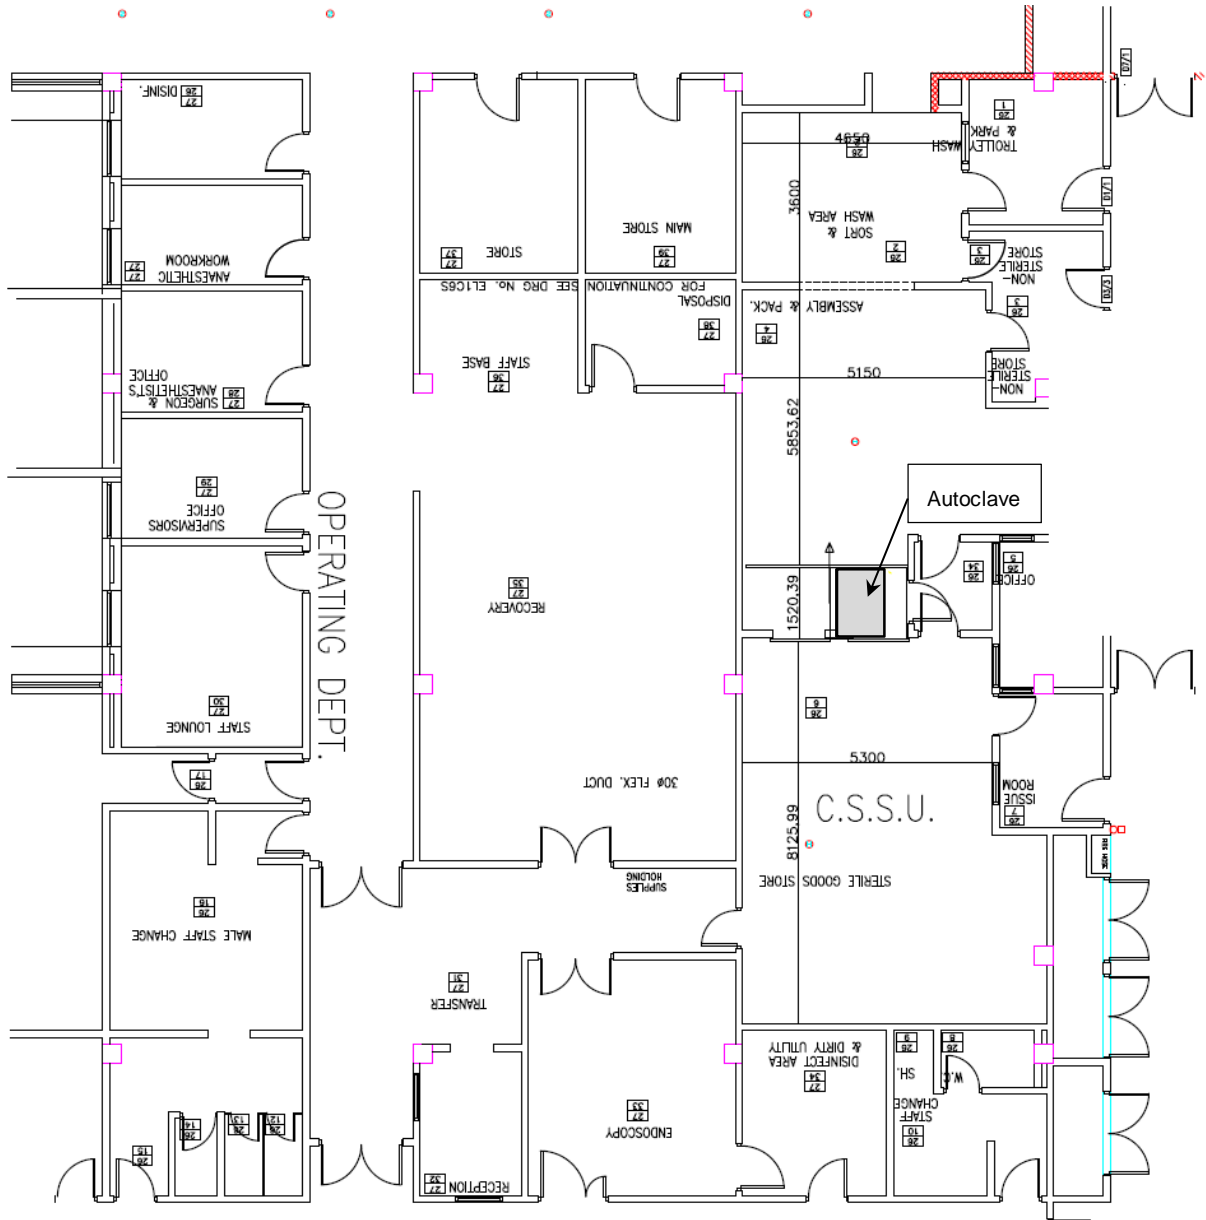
Floor plan of Autoclave (1st FL in Emergency building)
